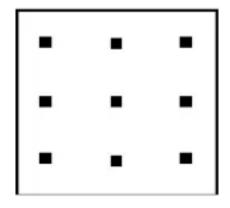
Sketch showing the Space frame supported by more than four intermediate columns
